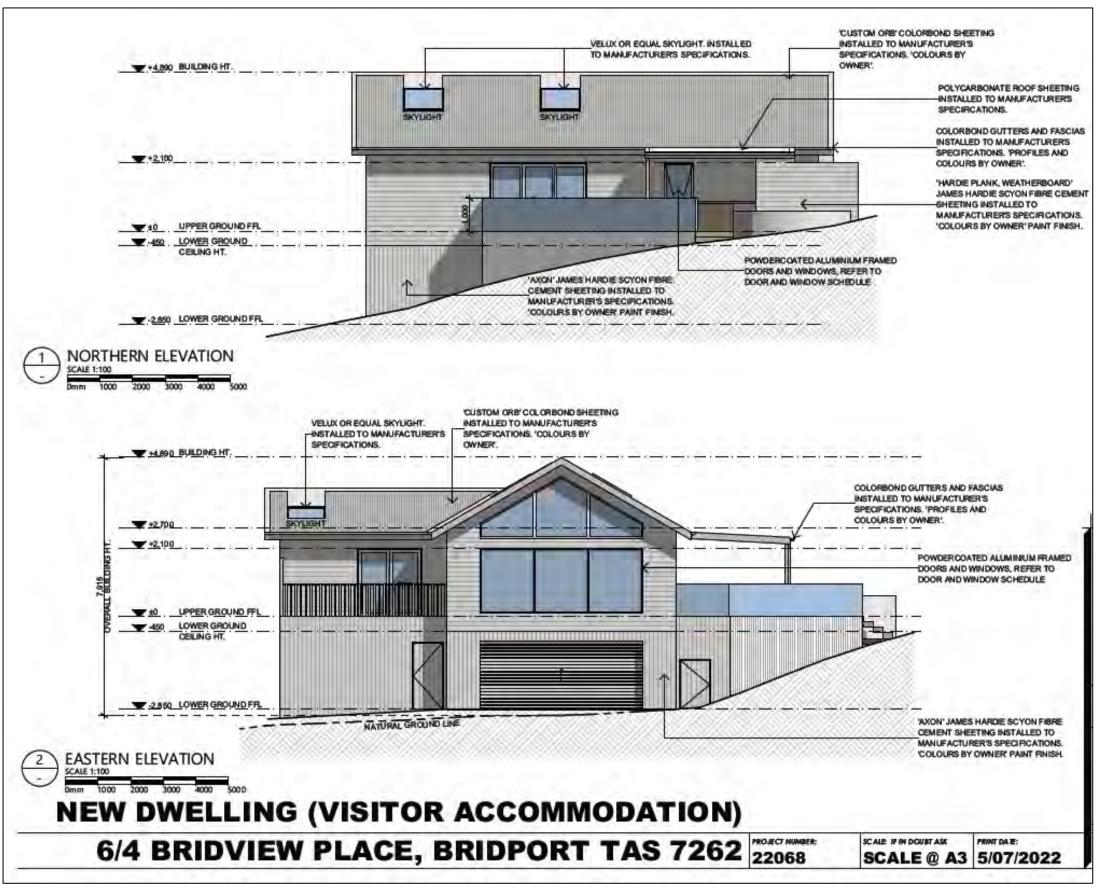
Northern and Eastern elevations of proposed visitor accommodation unit (source: Plans to Build 2022)
